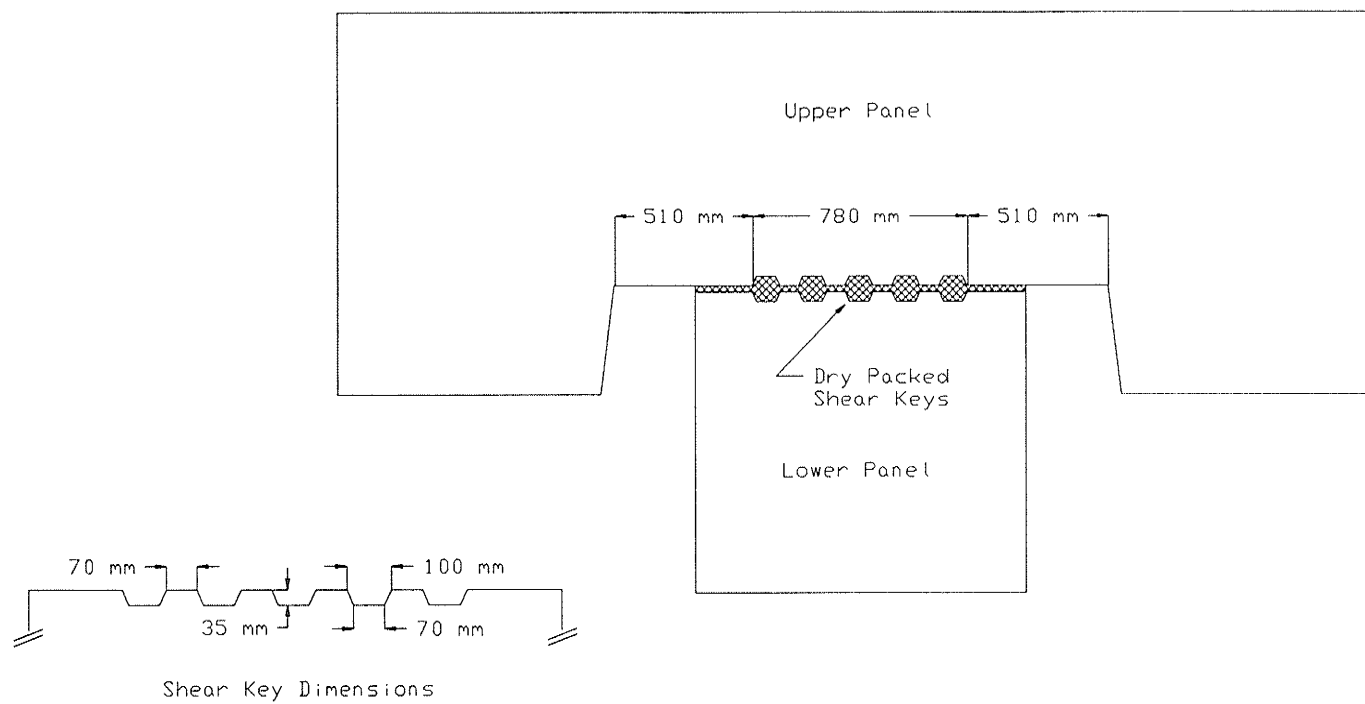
Specimen SK Configuration and Shear Key Dimensions
